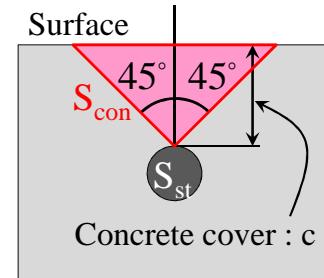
Cross section of concrete ; It is shown range of heat diffusion from rebar
